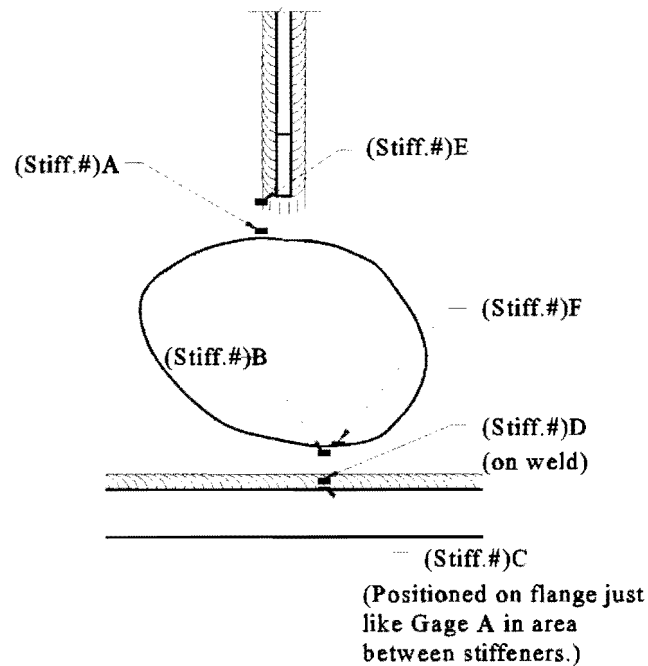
Additional strain gage locations for Girder 1 (at stiffener locations).
